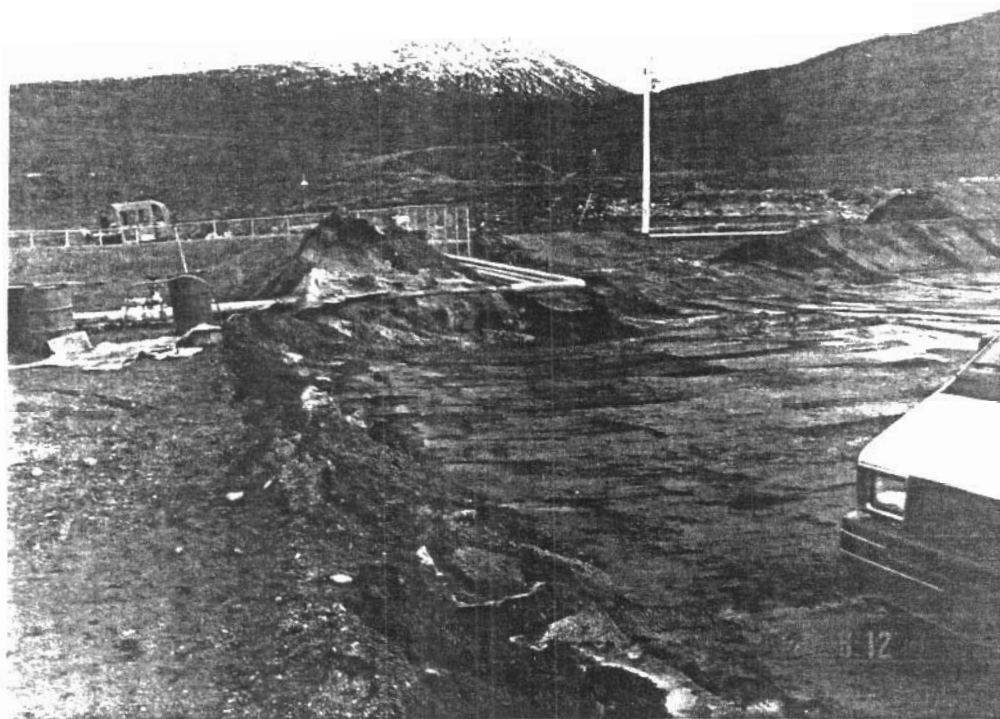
Expansion of tank farm berm; geotextile membrane liner noted.
